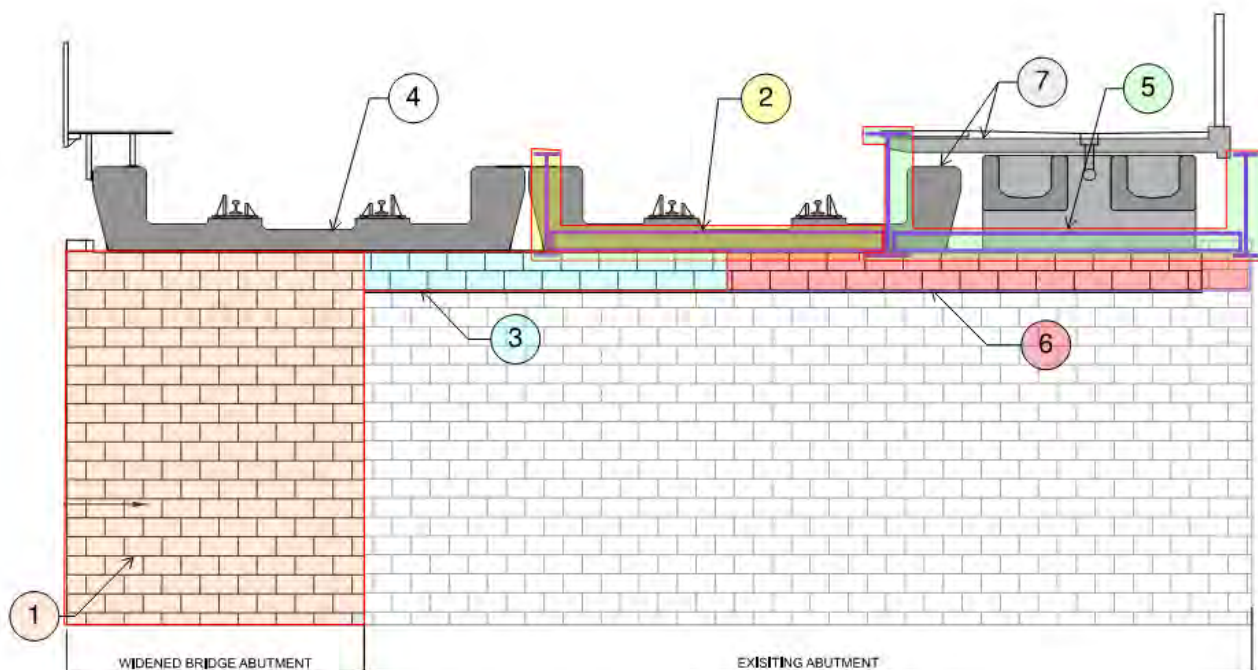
Section of proposed works for Dublin Road Bridge (UBK01)
